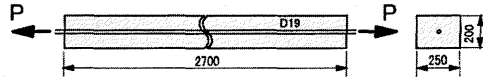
Schematic Diagram of Tensile Test of Reinforcement Embedded in Concrete
